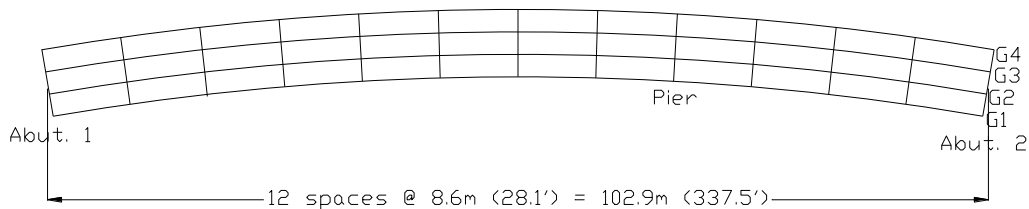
Simplified Framing Plan, Unbalanced Two-Span, 4-Girder, 305-m (1000-ft) Radius Bridge.
